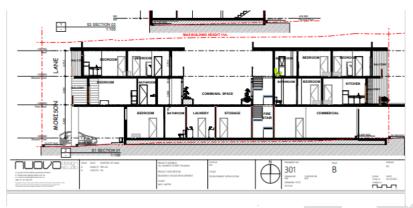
Proposed section plan illustrating atrium and built to boundary setbacks.
